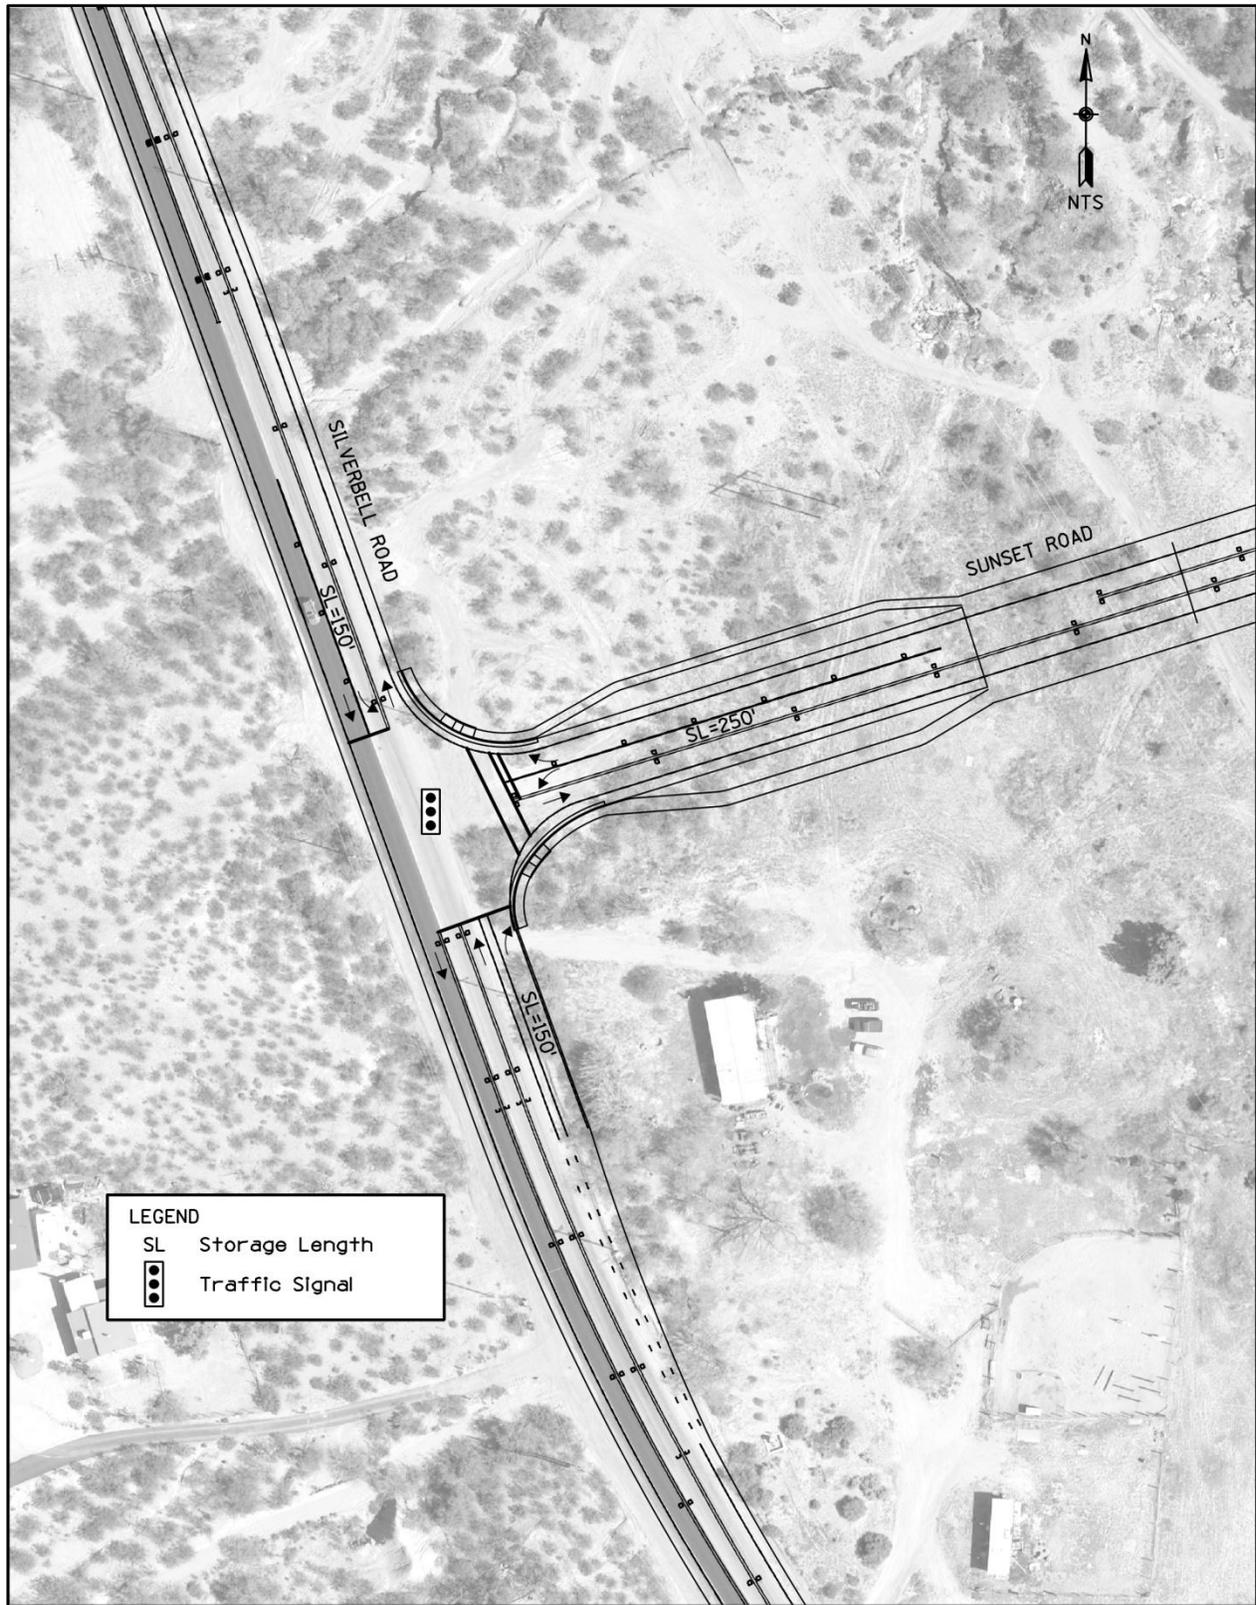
Proposed Lane Configuration at Sunset Road/Silverbell Road Intersection
